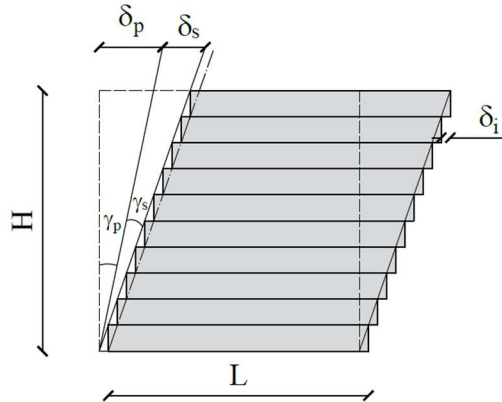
Shear deformation and sliding between the layers of the 3DPC wall.
